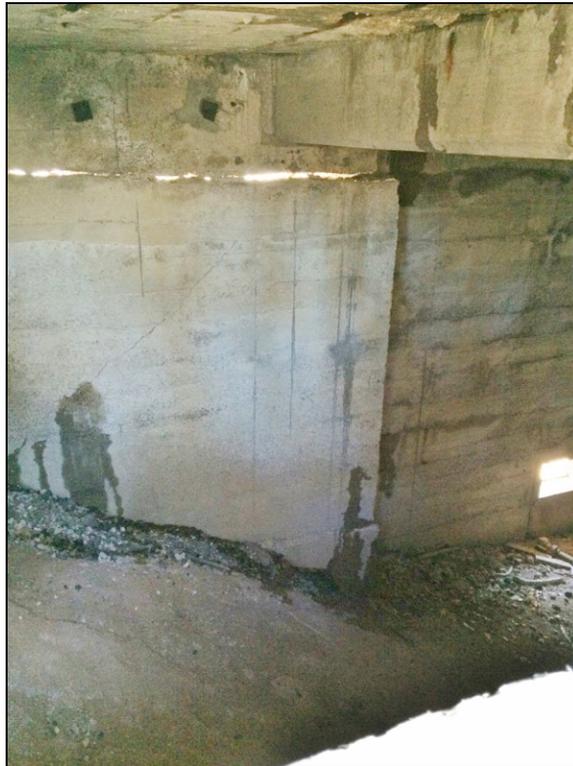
1 ½" settlement of failed portion of north abutment east wingwall provides no support for deck above (looking east)
